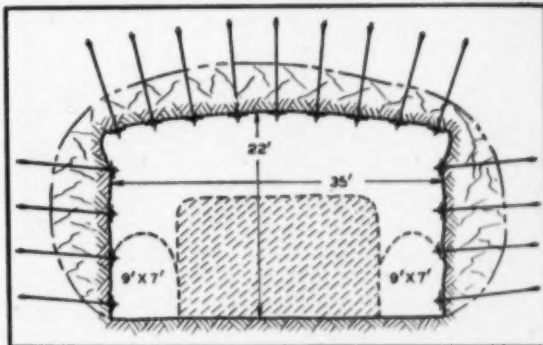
The rock-bolting method used to excavate an underground hoist room on the 4000 level of the Mt. Con mine.
